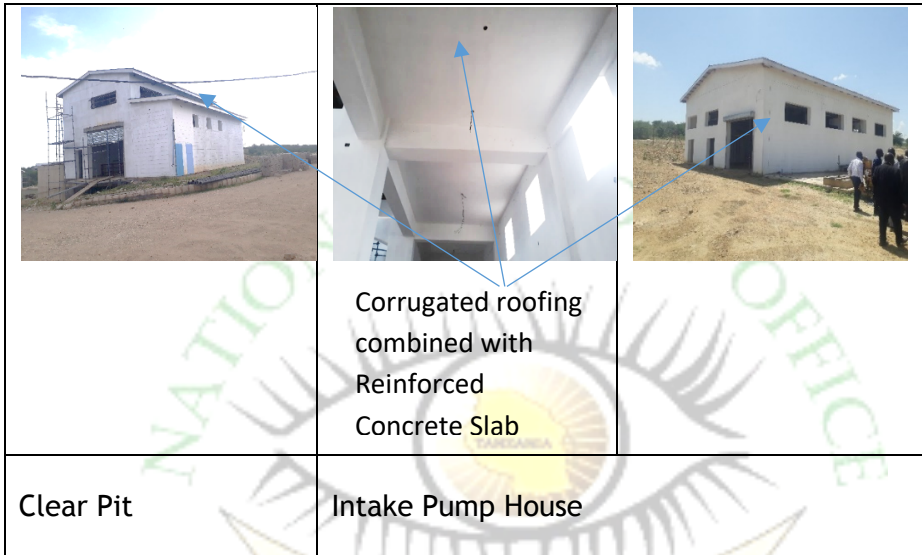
Reinforced Concrete Slab in a Single Storey Building (Photo was taken by Auditors on 21st December, 2020)
